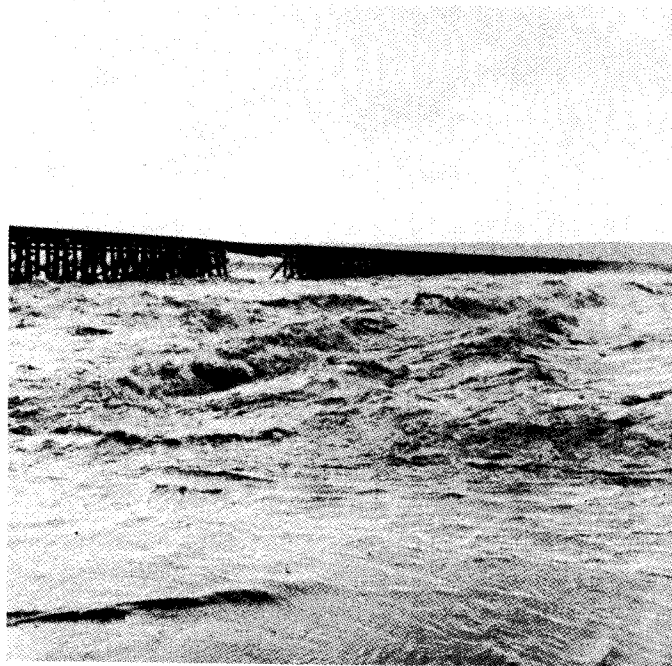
The Atchison, Topeka and Santa Fe railroad bridge near Hesperia. About a 100-foot span of the railroad bridge was washed out. Rock Springs Road, a dip crossing, was completely inundated by the flood. January 1969
